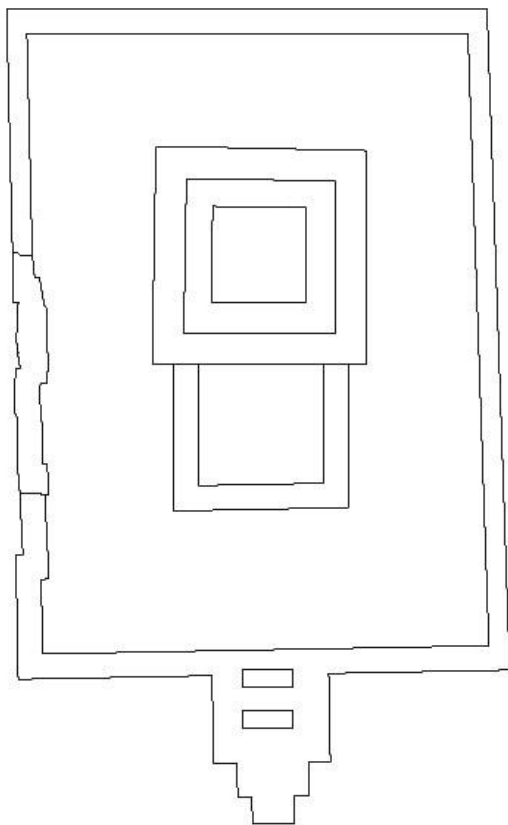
Ground Floor Plan . Source: Department of archeology , ministry of cultural affairs
